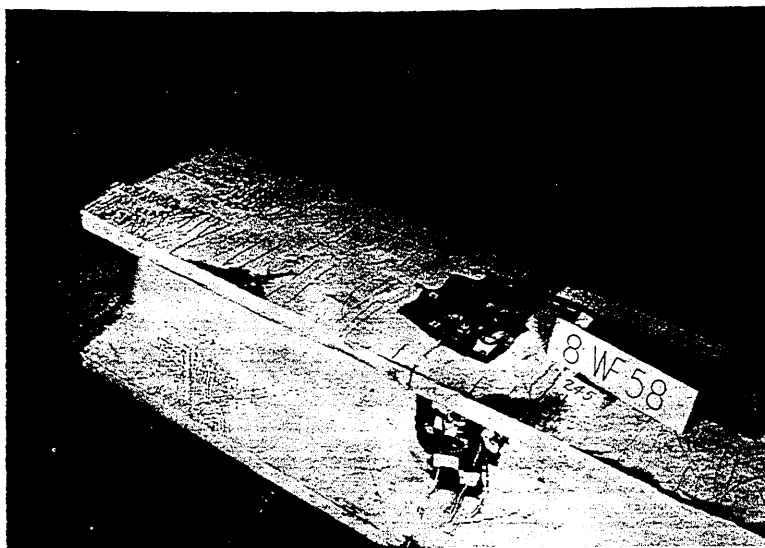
BEAM B1 - CENTRAL SECTION - LOAD = 245 KIPS
